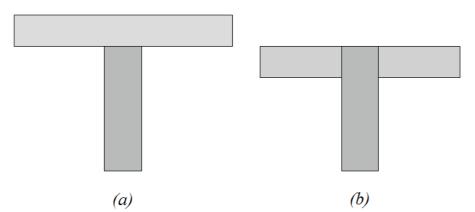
Example of how beams can be placed, (a) continuous beam, (b) simply supported beams.
